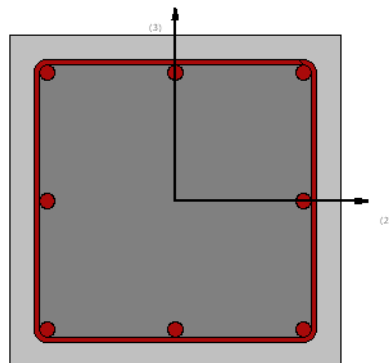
Rectangular Column section 0.35x0.35 (8 No.16) for floor (7 and 8).
